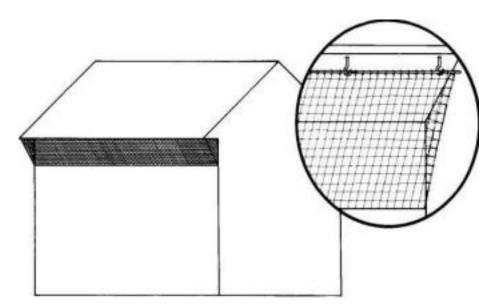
Netting mounted on building from the outside edge of the eave down to the side of the building. Insert shows a method of attachment using hooks and dowels.
